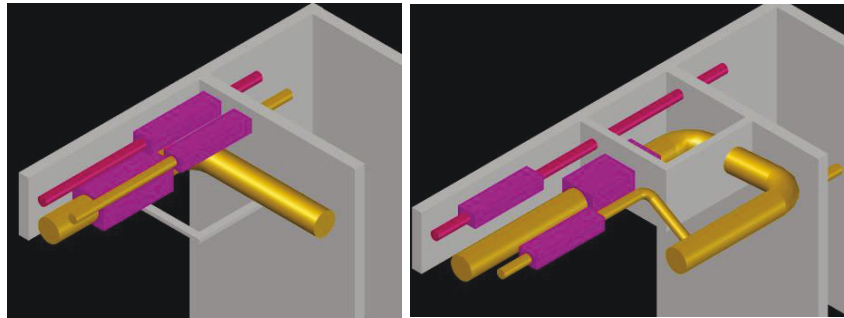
Ventilation ducts and structures as designed (5a, left) and as built (5b, right).
